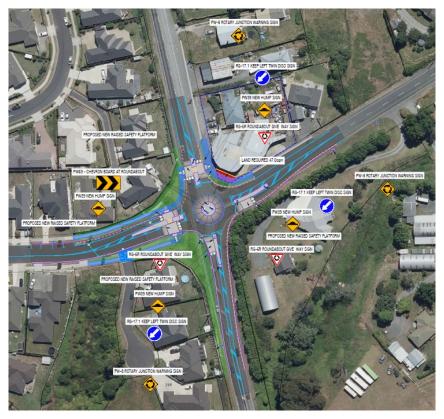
Puketaha/Gordonton Intersection – General Layout Plan – Mini Roundabout Option 4 Legs
